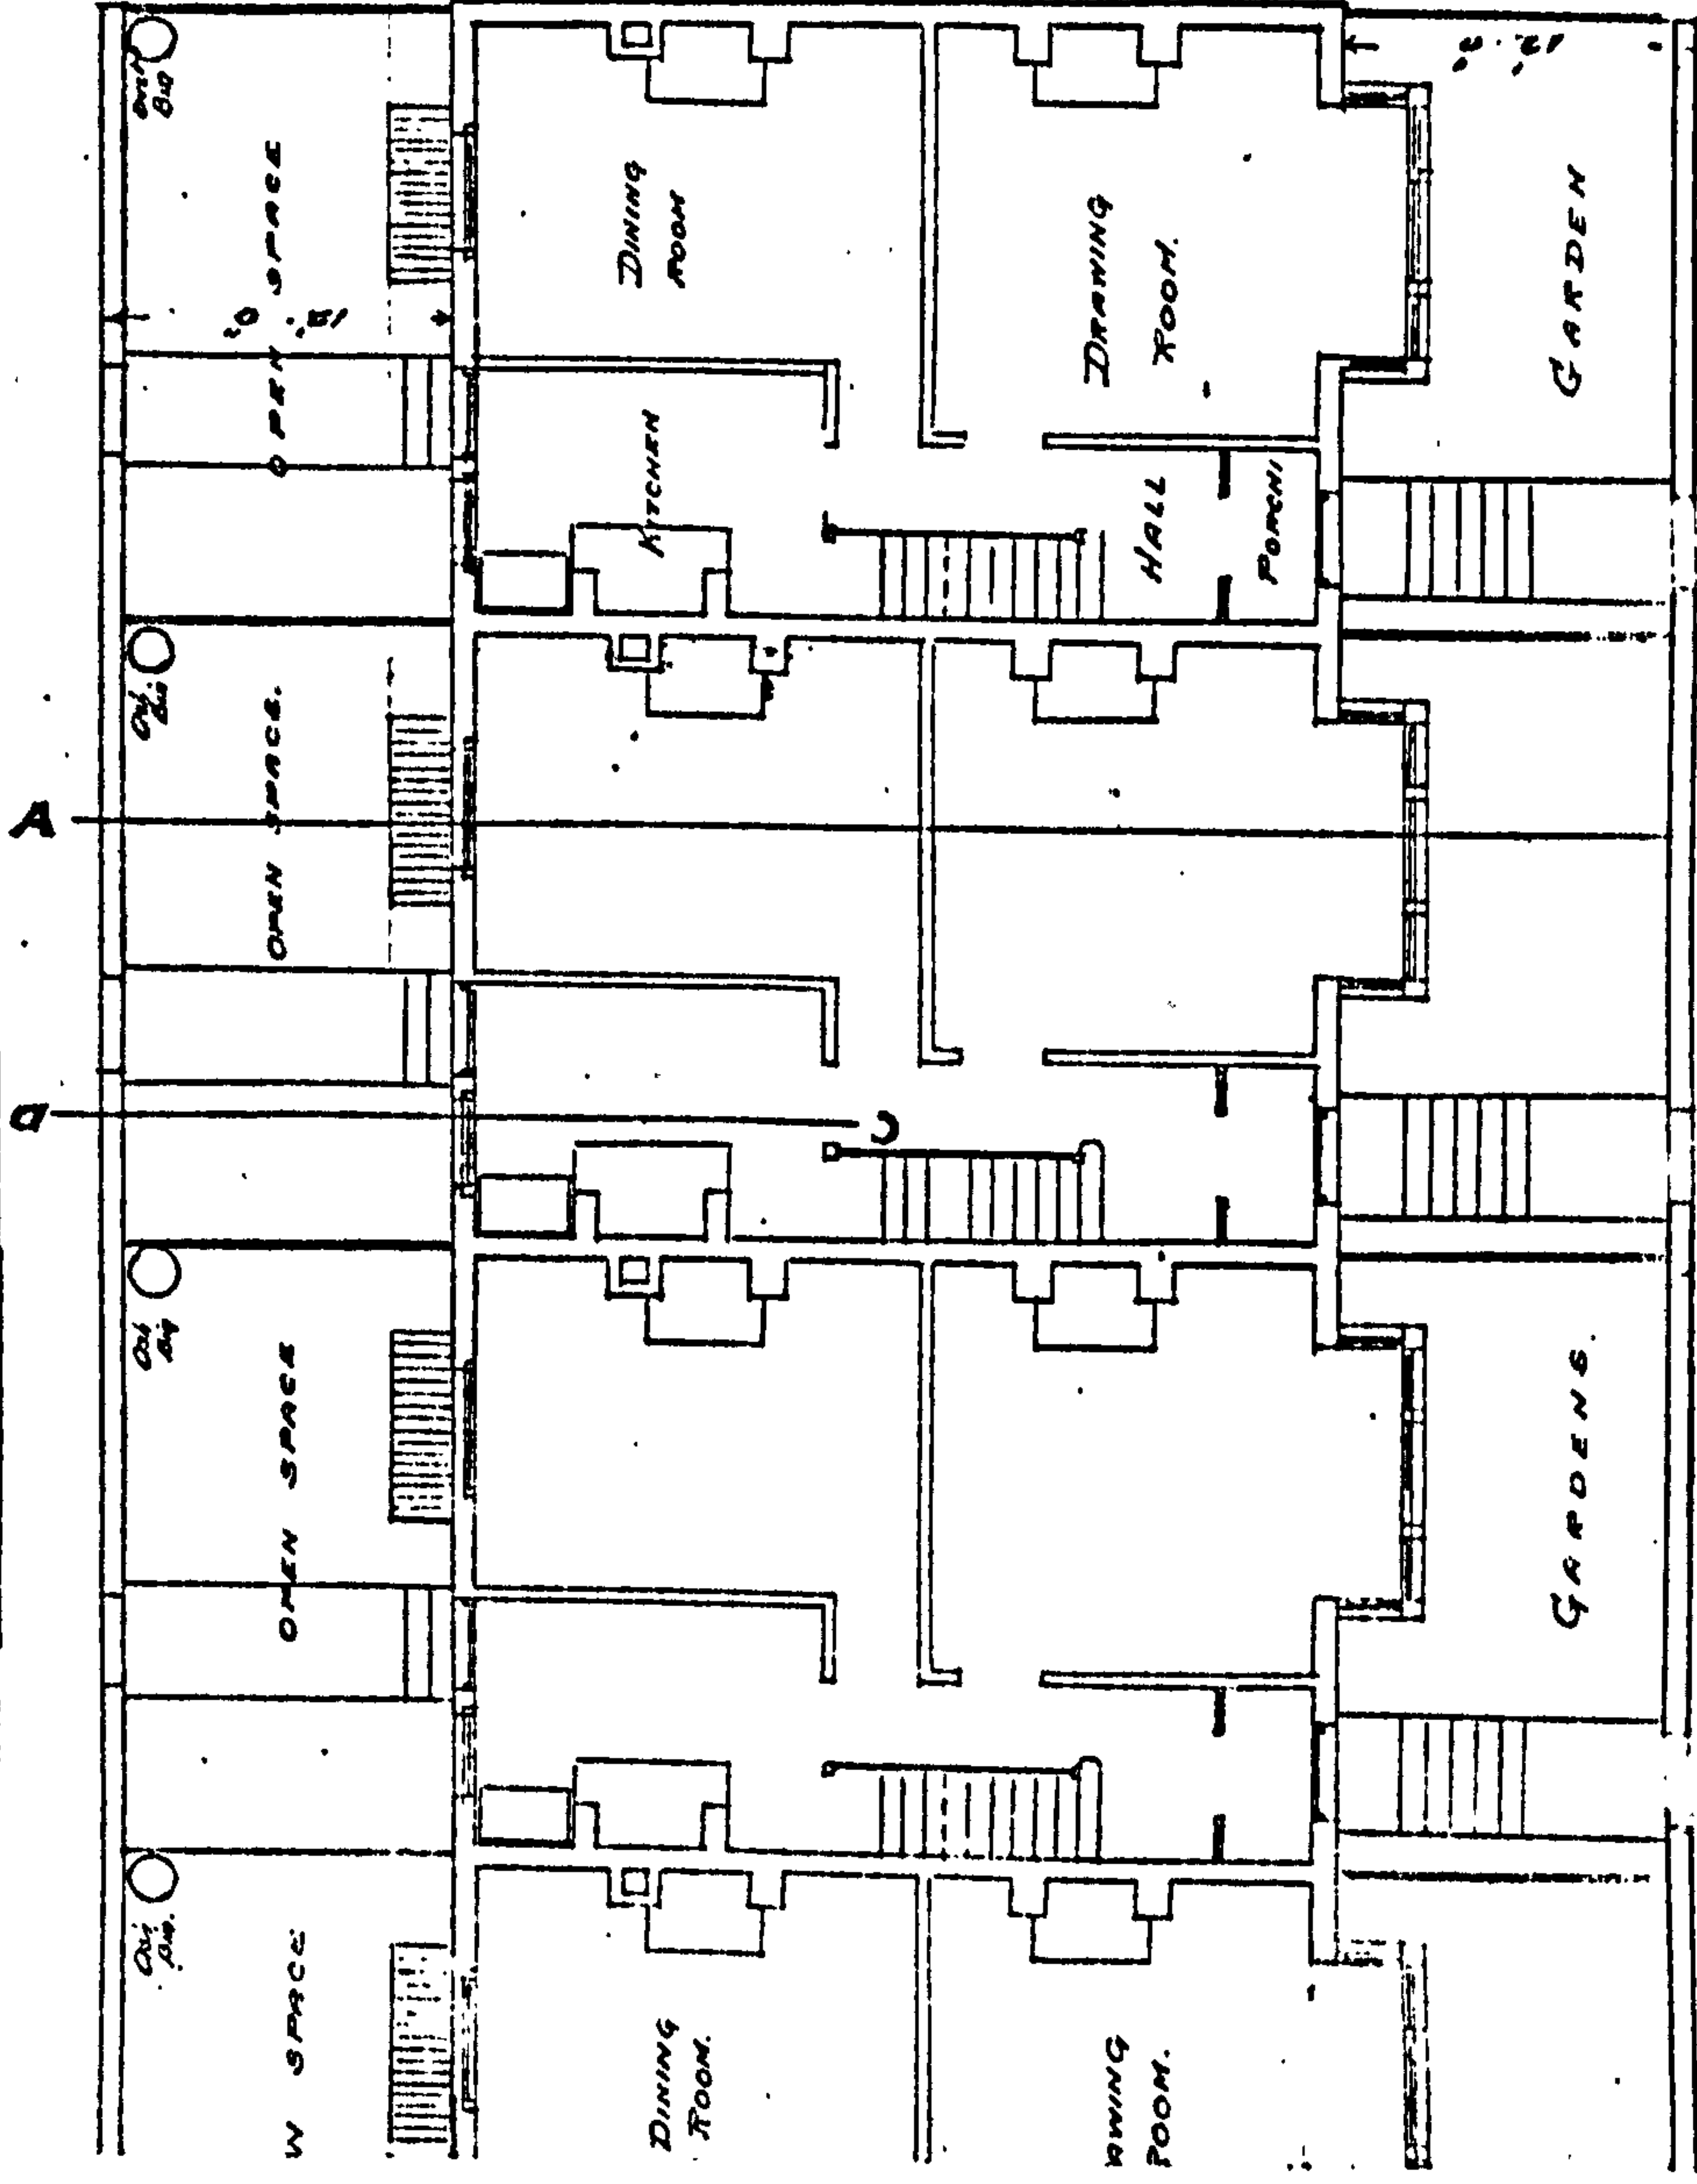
Deposited ground floor plan of three through houses, Bennett Road (W.H. Cliff 1890).
